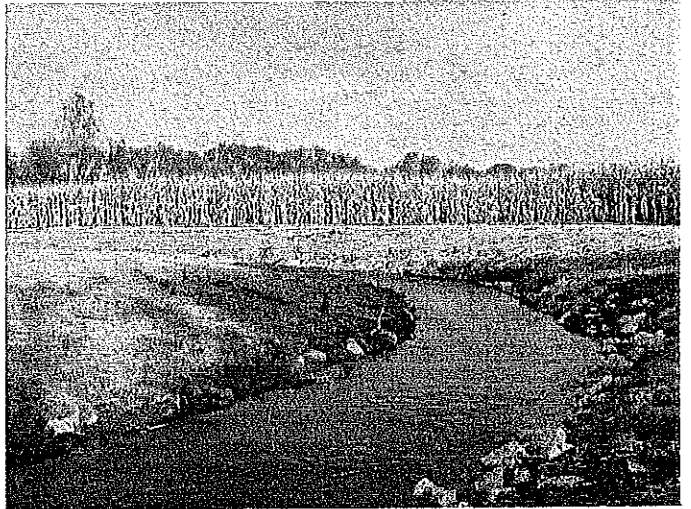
LUNKERS Installation and Streambank Stabilization
